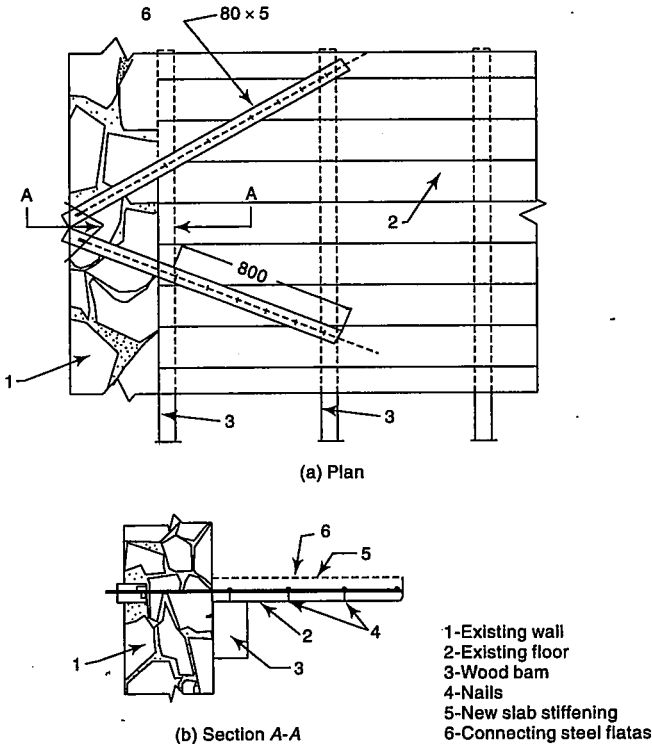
Connection of floor to wall (beams parallel to existing wall)
